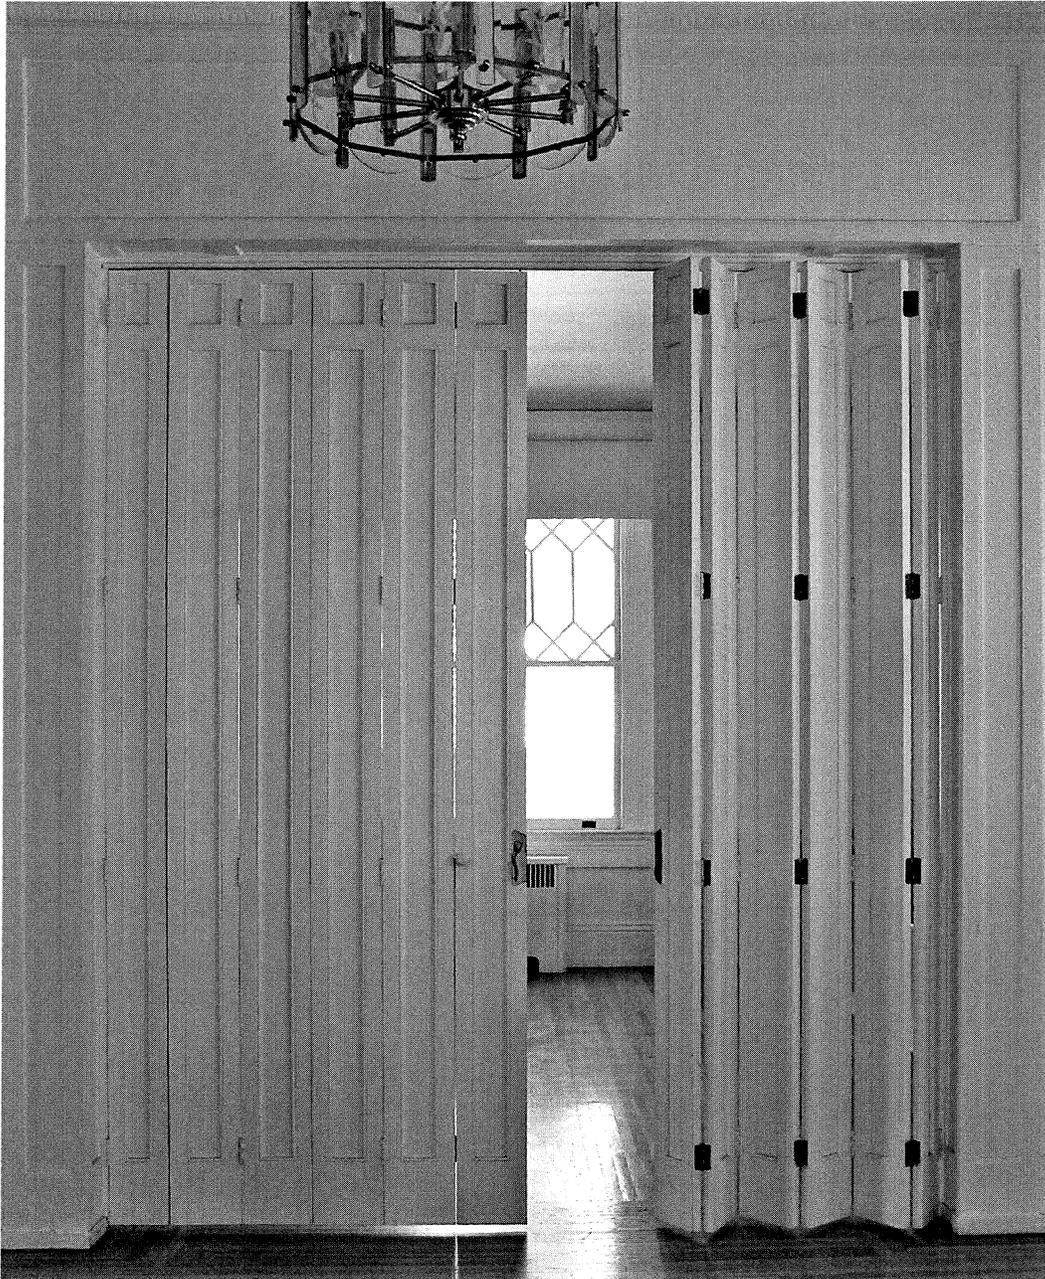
Detail of folding doors leading from entry hall into the dining room.
